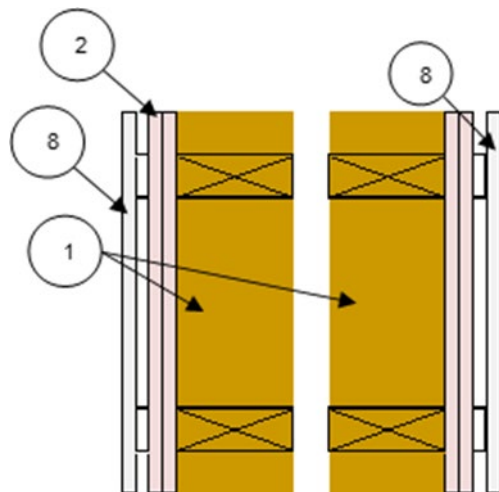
Timber framed double stud wall with non-fire grade linings – Section view
